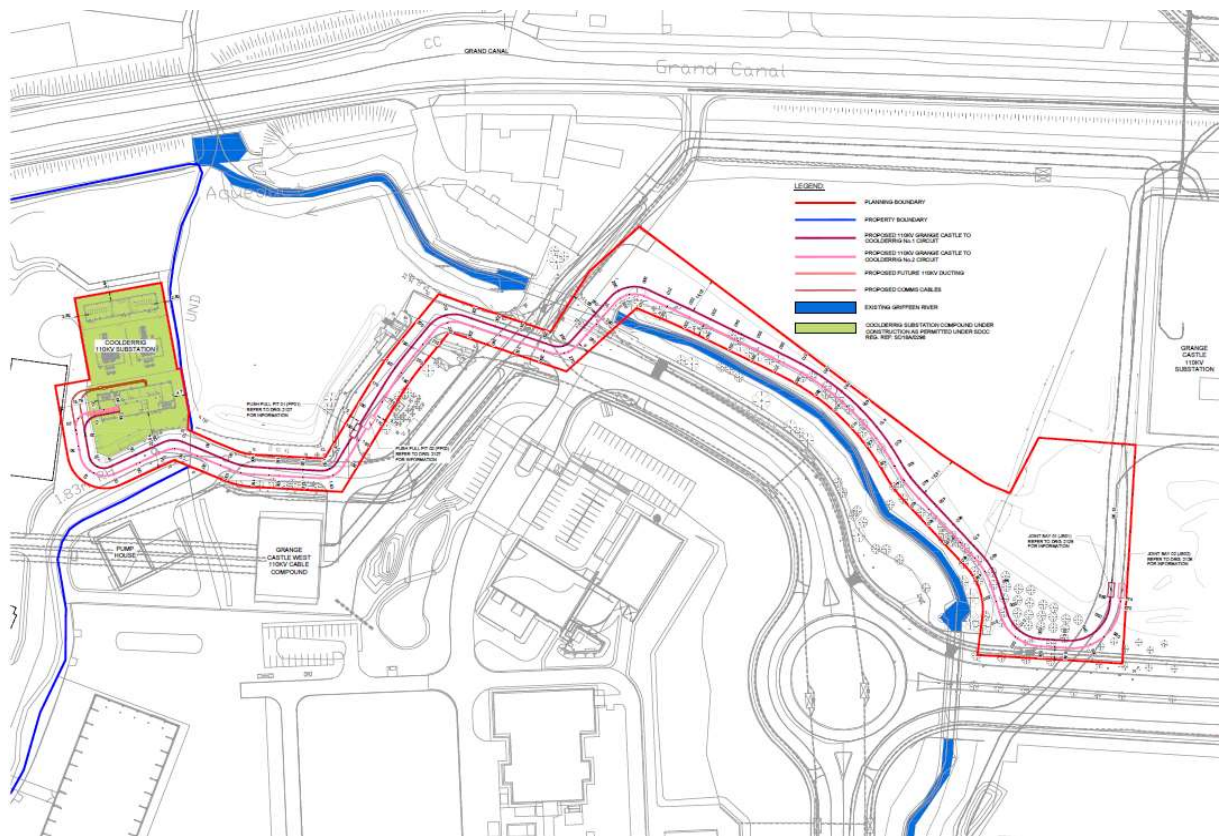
Proposed site layout plan of the Proposed Development site indicating proposed 110 kV transmission lines (Source: Drawing no. 20_167-CSE-00-XX-DR-C-2120, CSEA Consulting Engineers)
